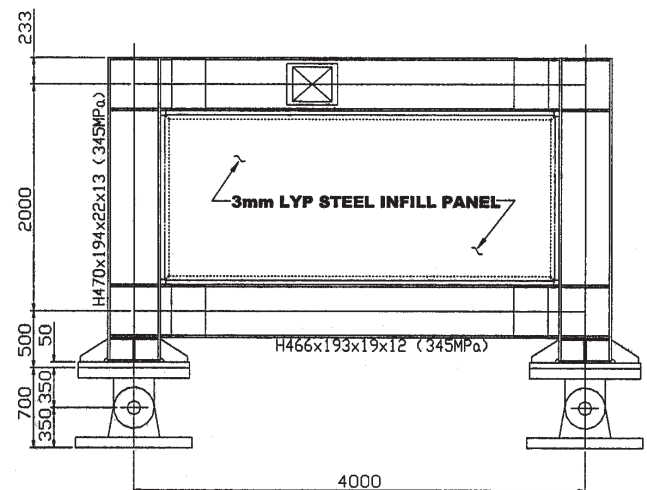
Steel plate shear wall test specimen with low-yield steel.
